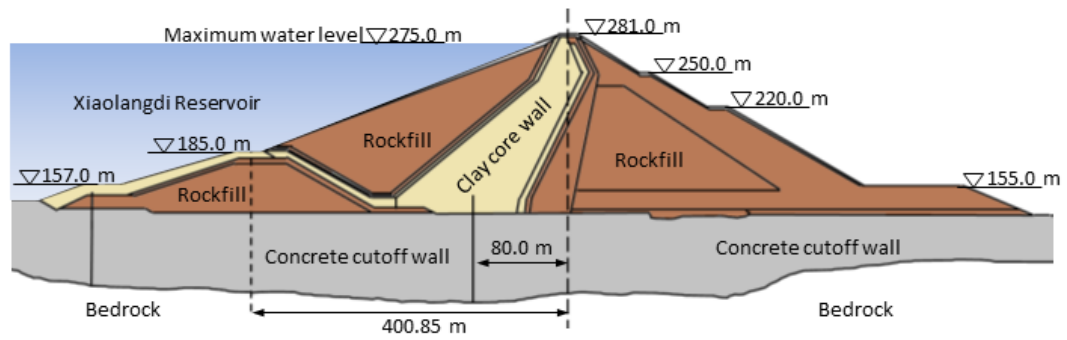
A typical cross-sectional view of Xiaolangdi Dam. This diagram is adapted from Li (2009).
